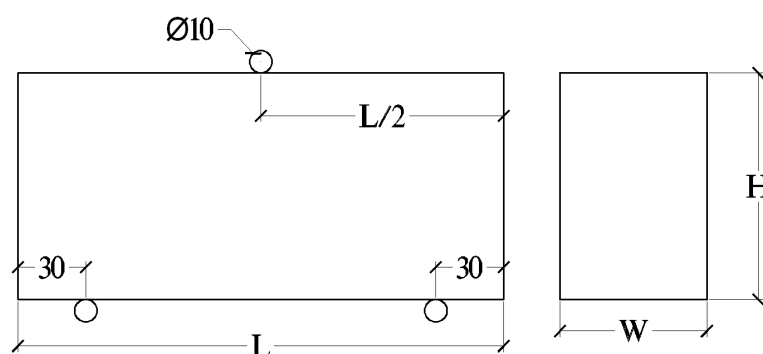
Bending tensile test of concrete brick with greater bending stiffness (mm)
